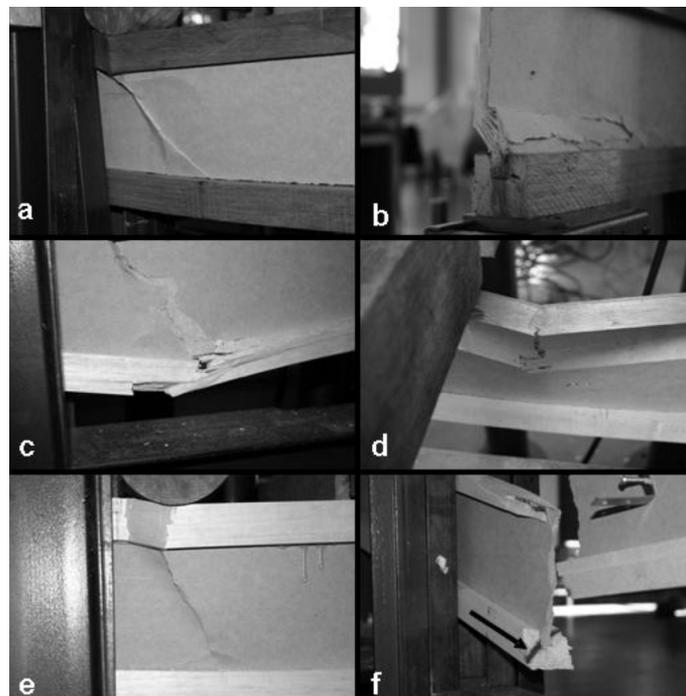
I-beam failure pattern—(a) castanha-de-macaco: failure in compression and web crushing, (b) castanha-de-macaco: web crushing at end reaction, (c) marupá: failure in tension, (d) marupá: top flange buckling, (e) marupá: failure in compression and (f) marupá: failure in tension caused by insect damage
